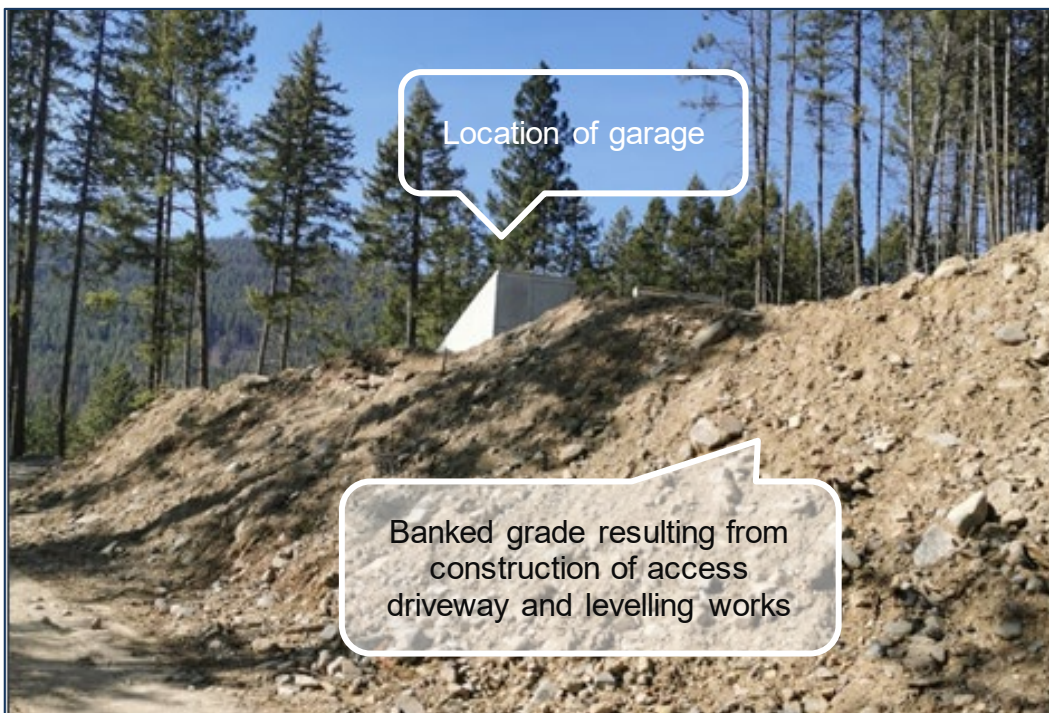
View of site seen from driveway and facing north-east. Given the topography, the garage is stepped above the driveway, with a banked grade up to site
